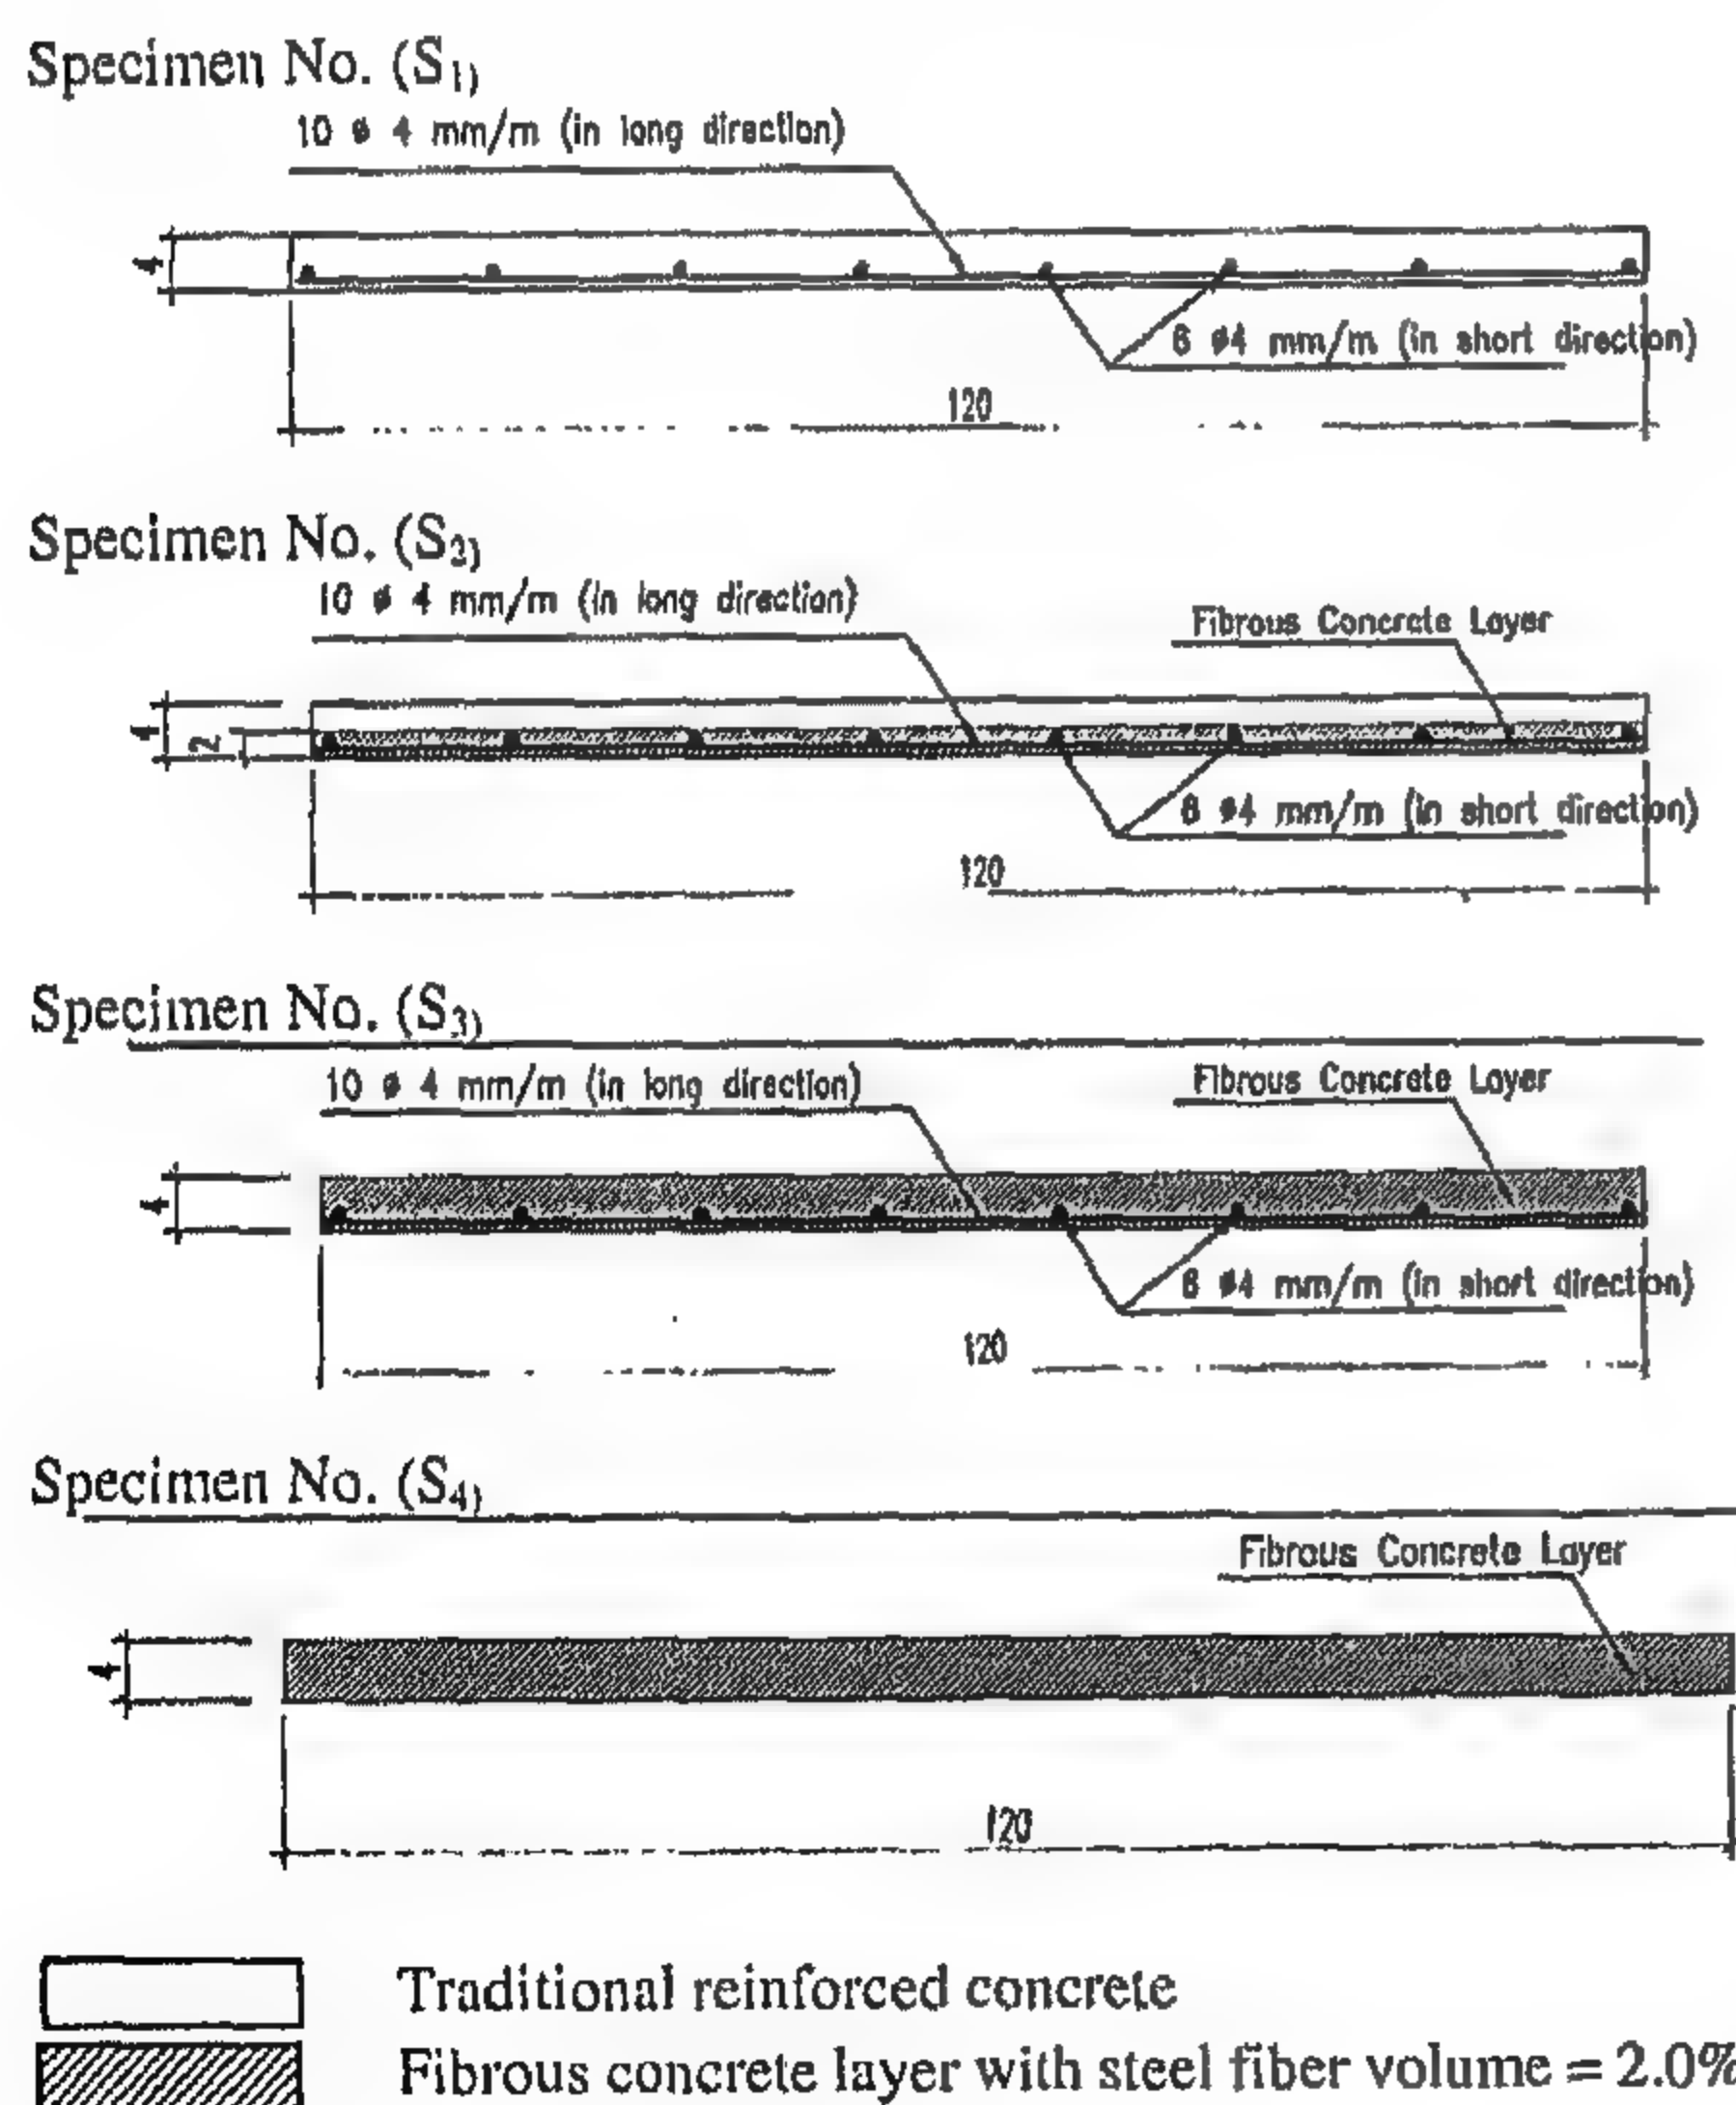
Detalis of reinforcement and fibrous concrete location on tested slabs
